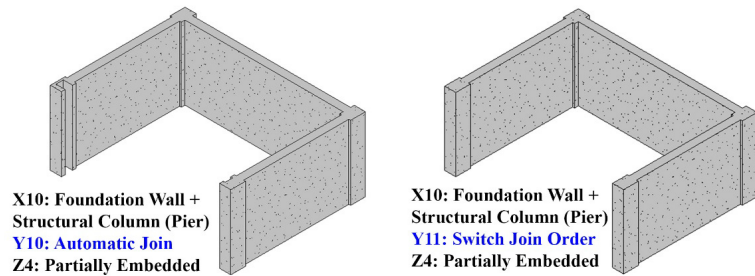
8th Model: structural columns partially embedded in foundation walls
